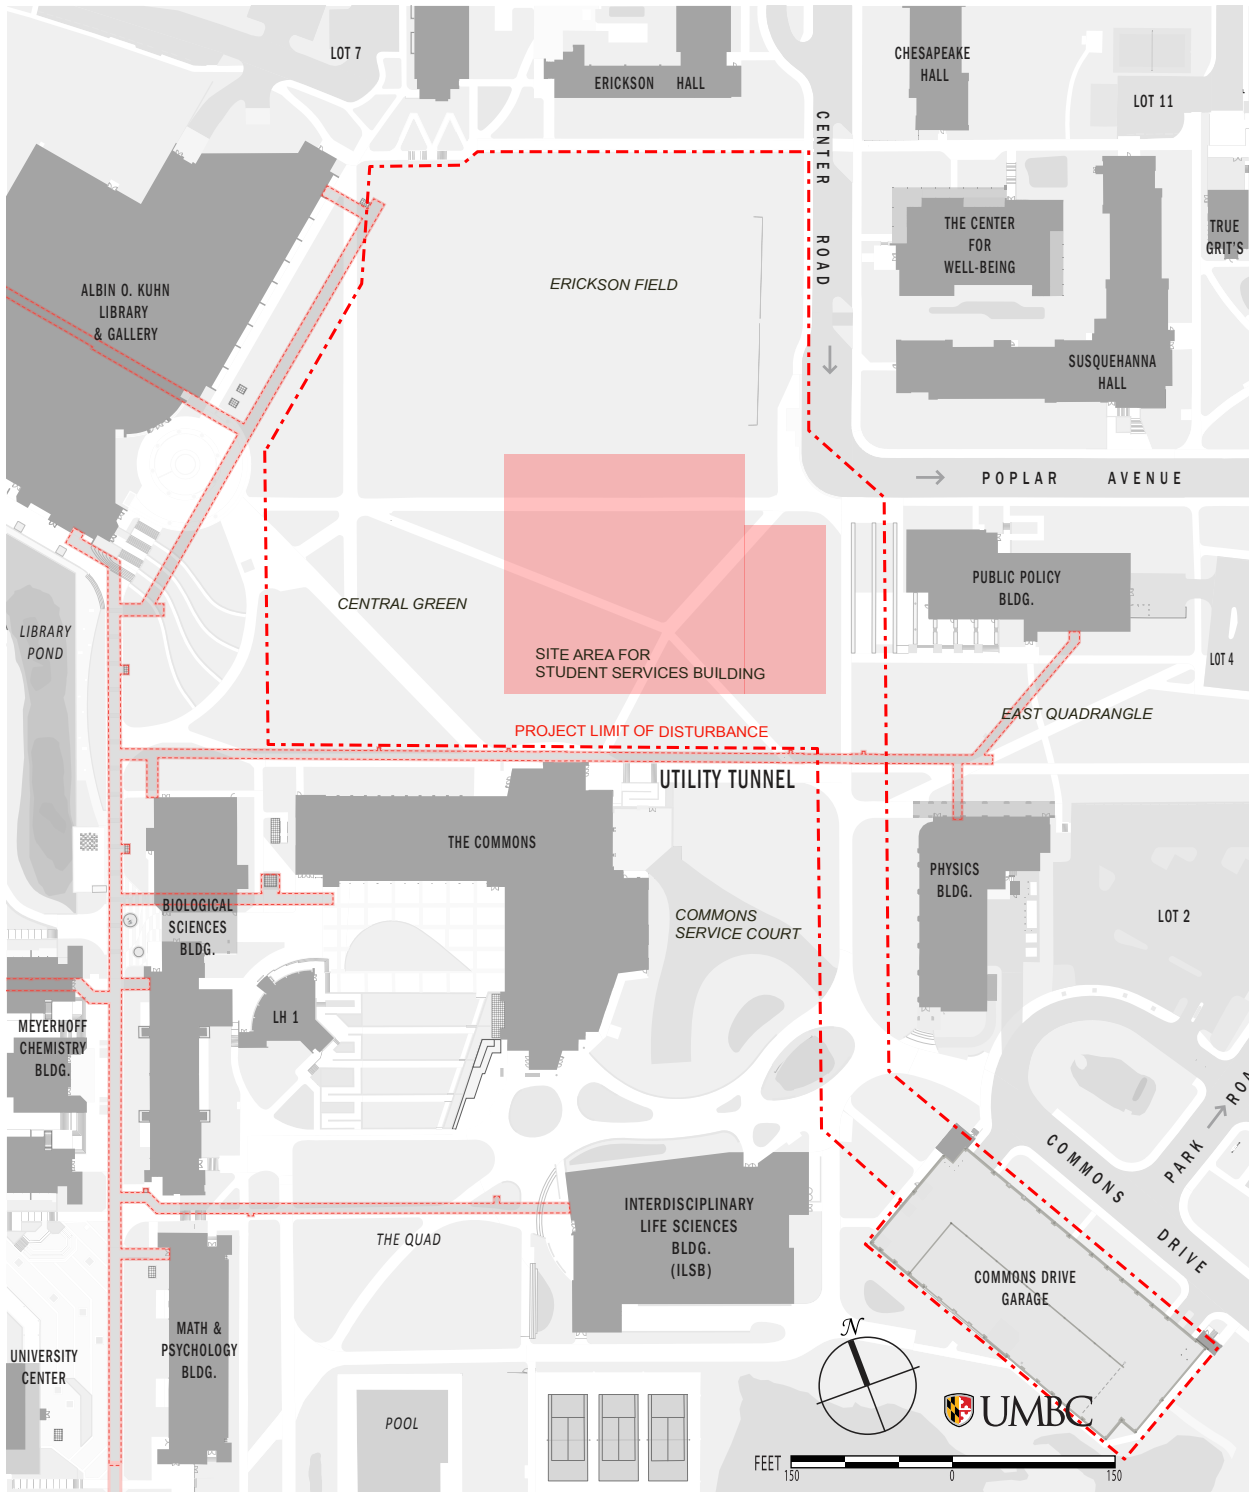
Existing Utility Tunnel and Location of the Chilled and HTHW Piping
